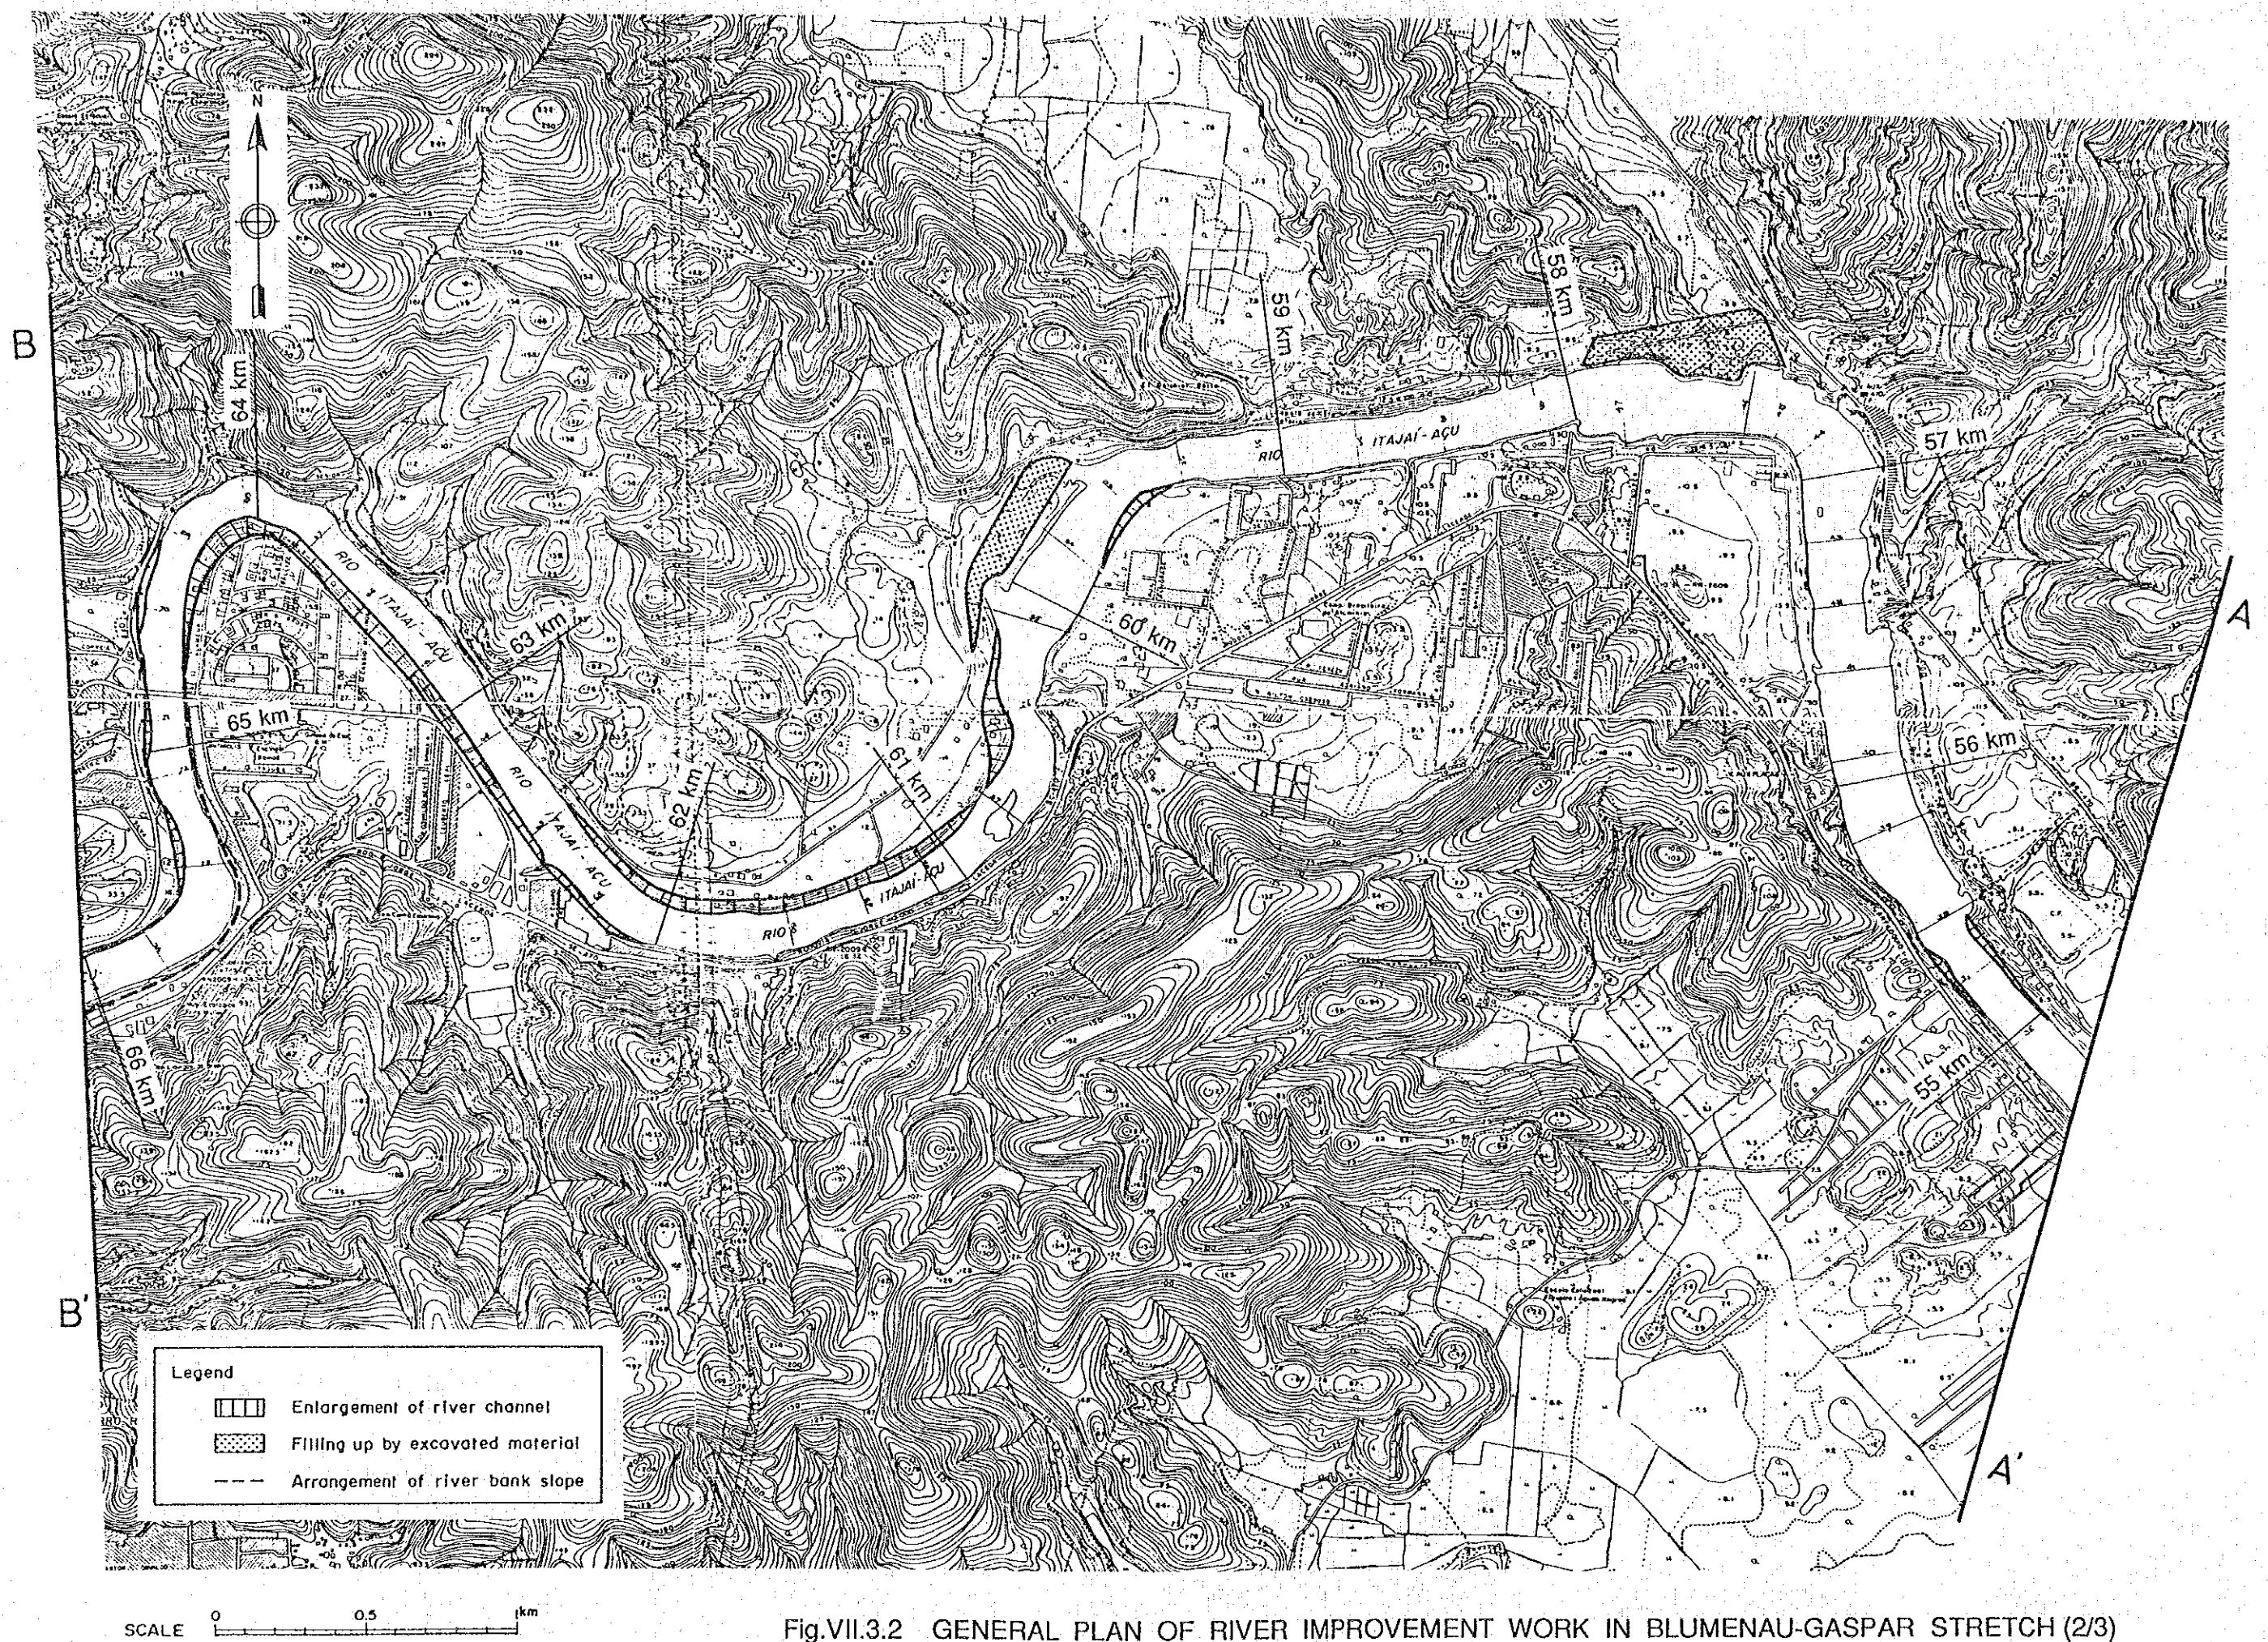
GENERAL PLAN OF RIVER IMPROVEMENT WORK IN BLUMENAU-GASPAR STRETCH (2/3)
